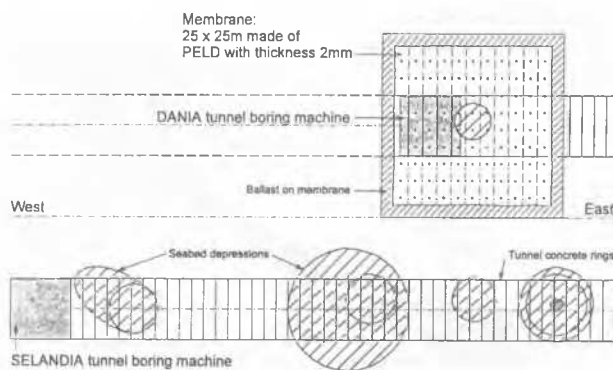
Position of tunnel boring machines Dania and Selandia at the time of fire in Dania and membrane placed at seabed to protect crewmen repairing damaged concrete roof in tunnel.
